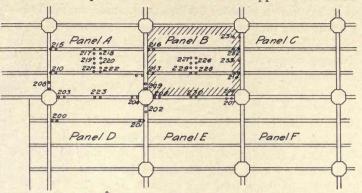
PLAN SHOWING LOCATION OF GAUGE LINES ON UPPER SIDE OF FLOOR.
